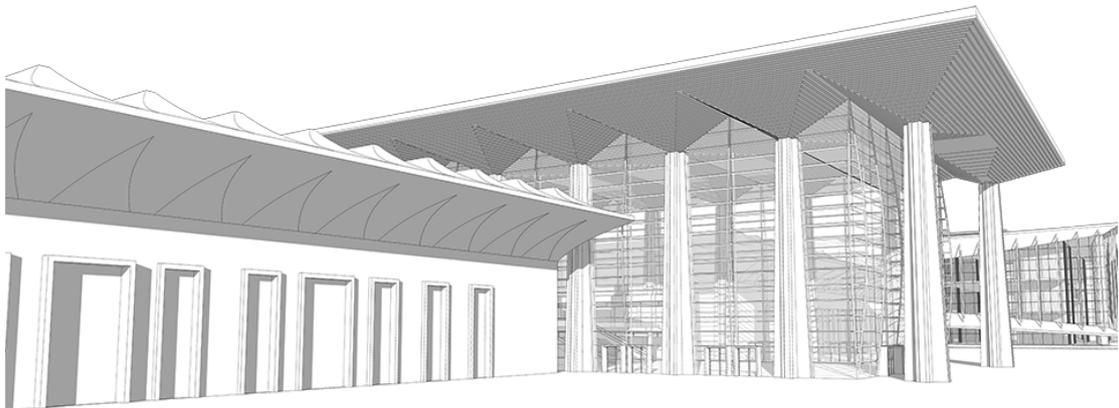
Design detail of Xi'an Silk Road International Exhibition Center (drawn by author)
